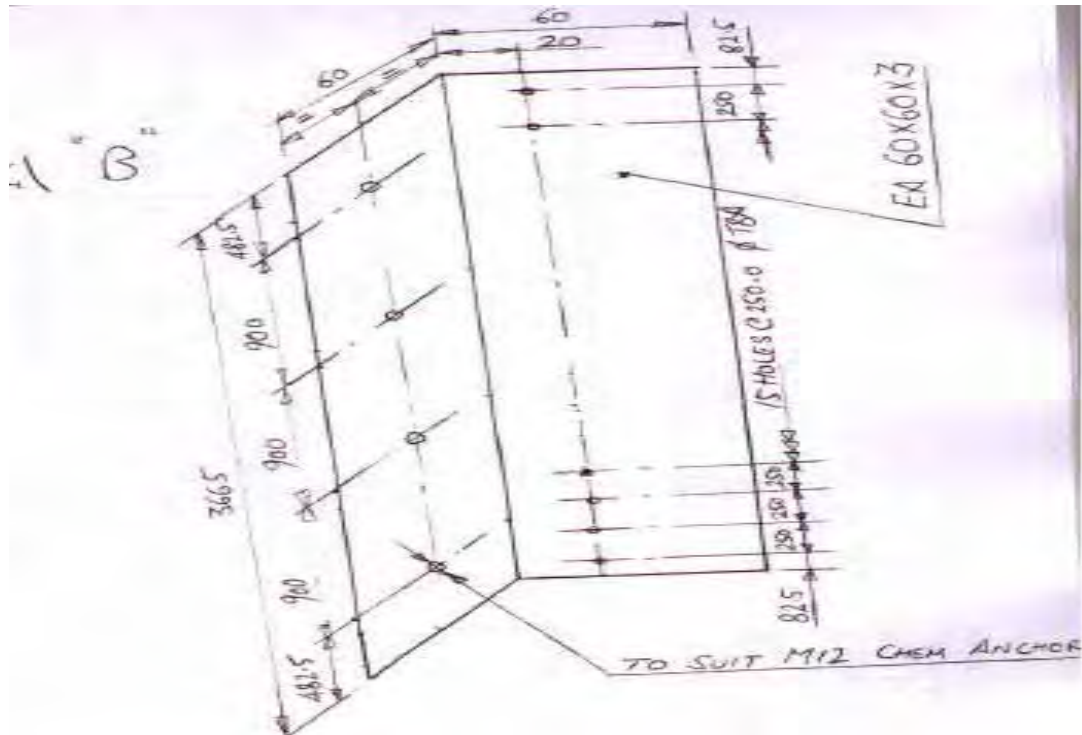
Sketch of aluminium equal angle 60 mm x 60 mm x 3 mm 6060 T5 (bottom section) chemically anchored to concrete wall and secured to louvre panels using riveting.
